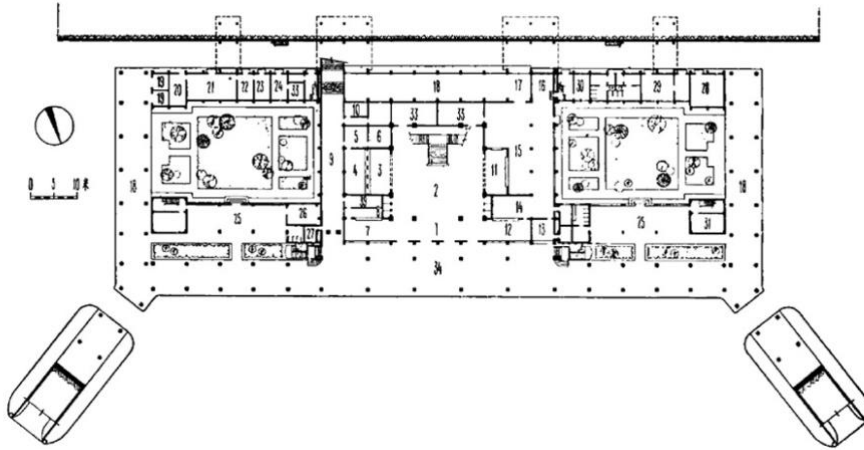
First-level floor plan, TAZARA Terminus. (Source: Third Railway Survey and Design Institute, 1976)
